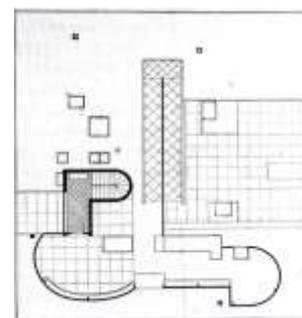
Roof Terrace Open Plan of Villa Savoye
